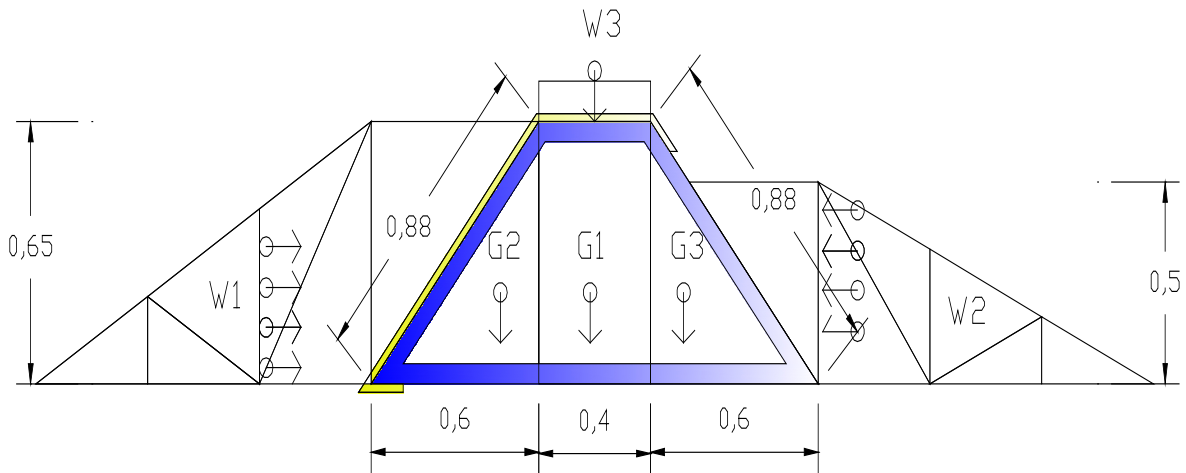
Model 4 Trapezoidal Gabion Weir + Geotex
